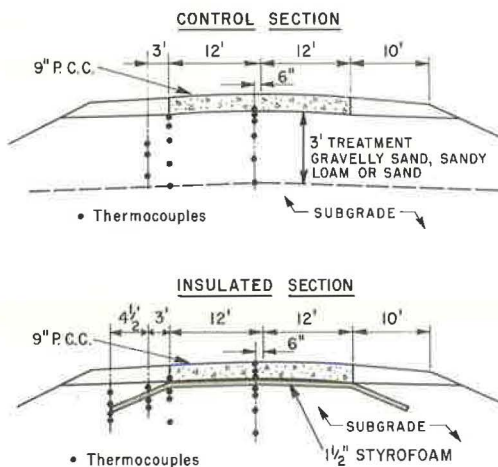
Cross-sections and thermocouples of control and insulated P.C.C. sections, West Union, Iowa.
